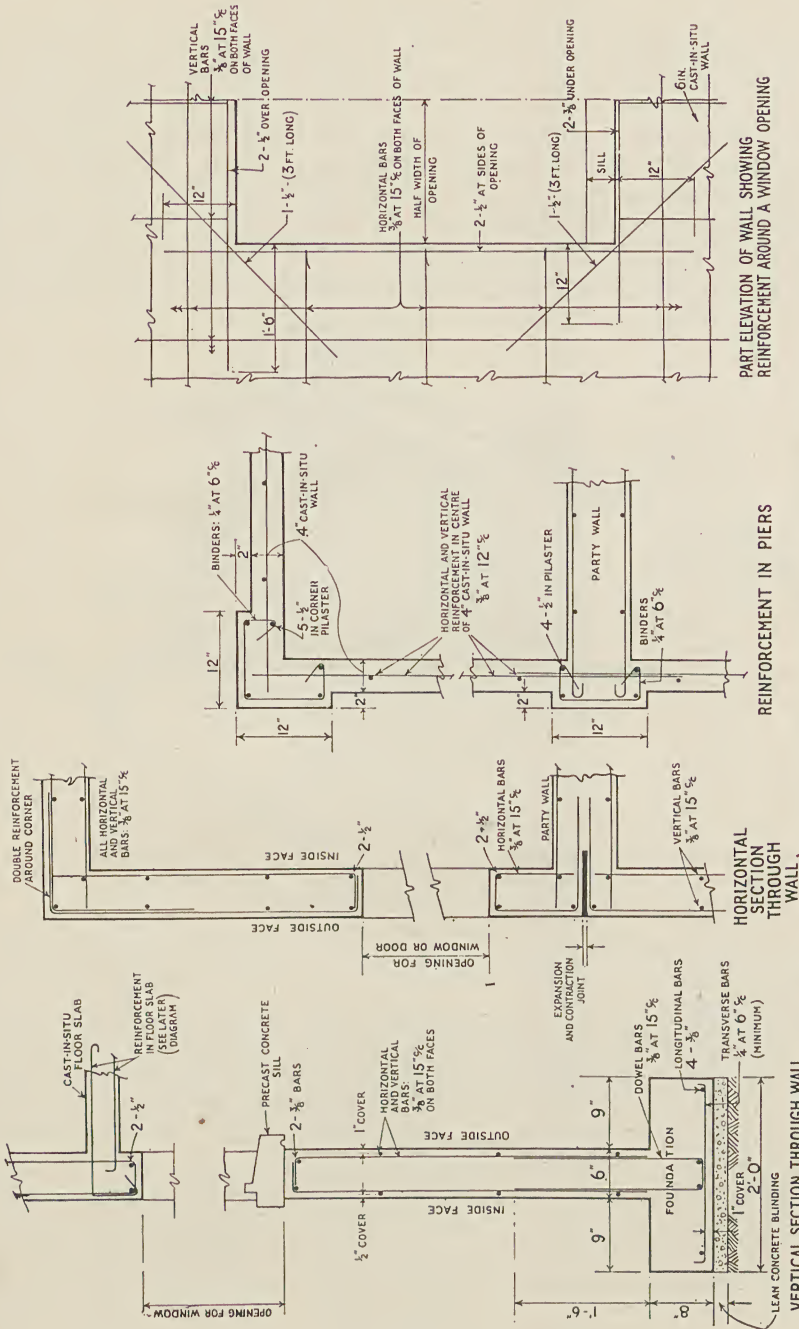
REINFORCEMENT FOR IN-SITU CONCRETE WALLS.
